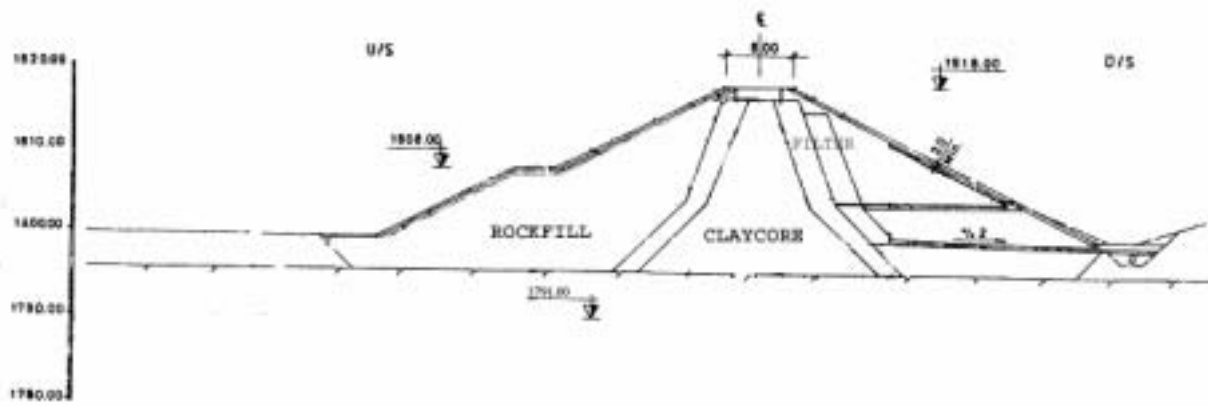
TYPICAL CROSS SECTION OF ABSHINE DAM
